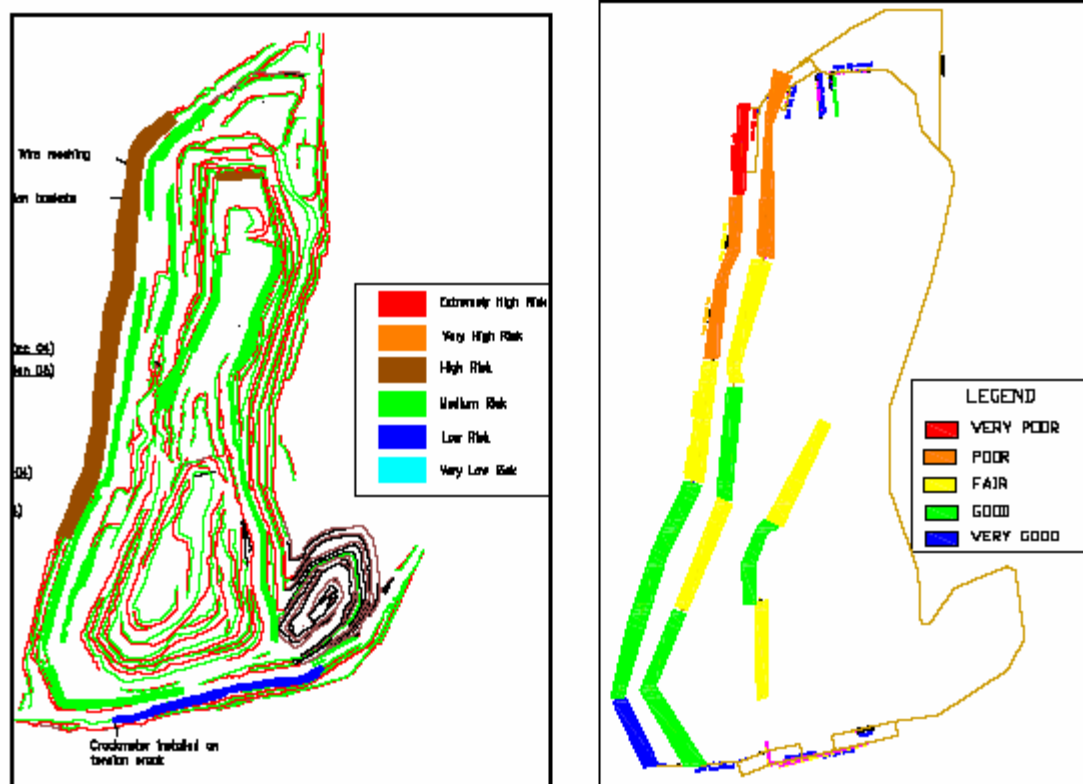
Examples of a) a Hazard plan & b) a Presplit rating bench plan
